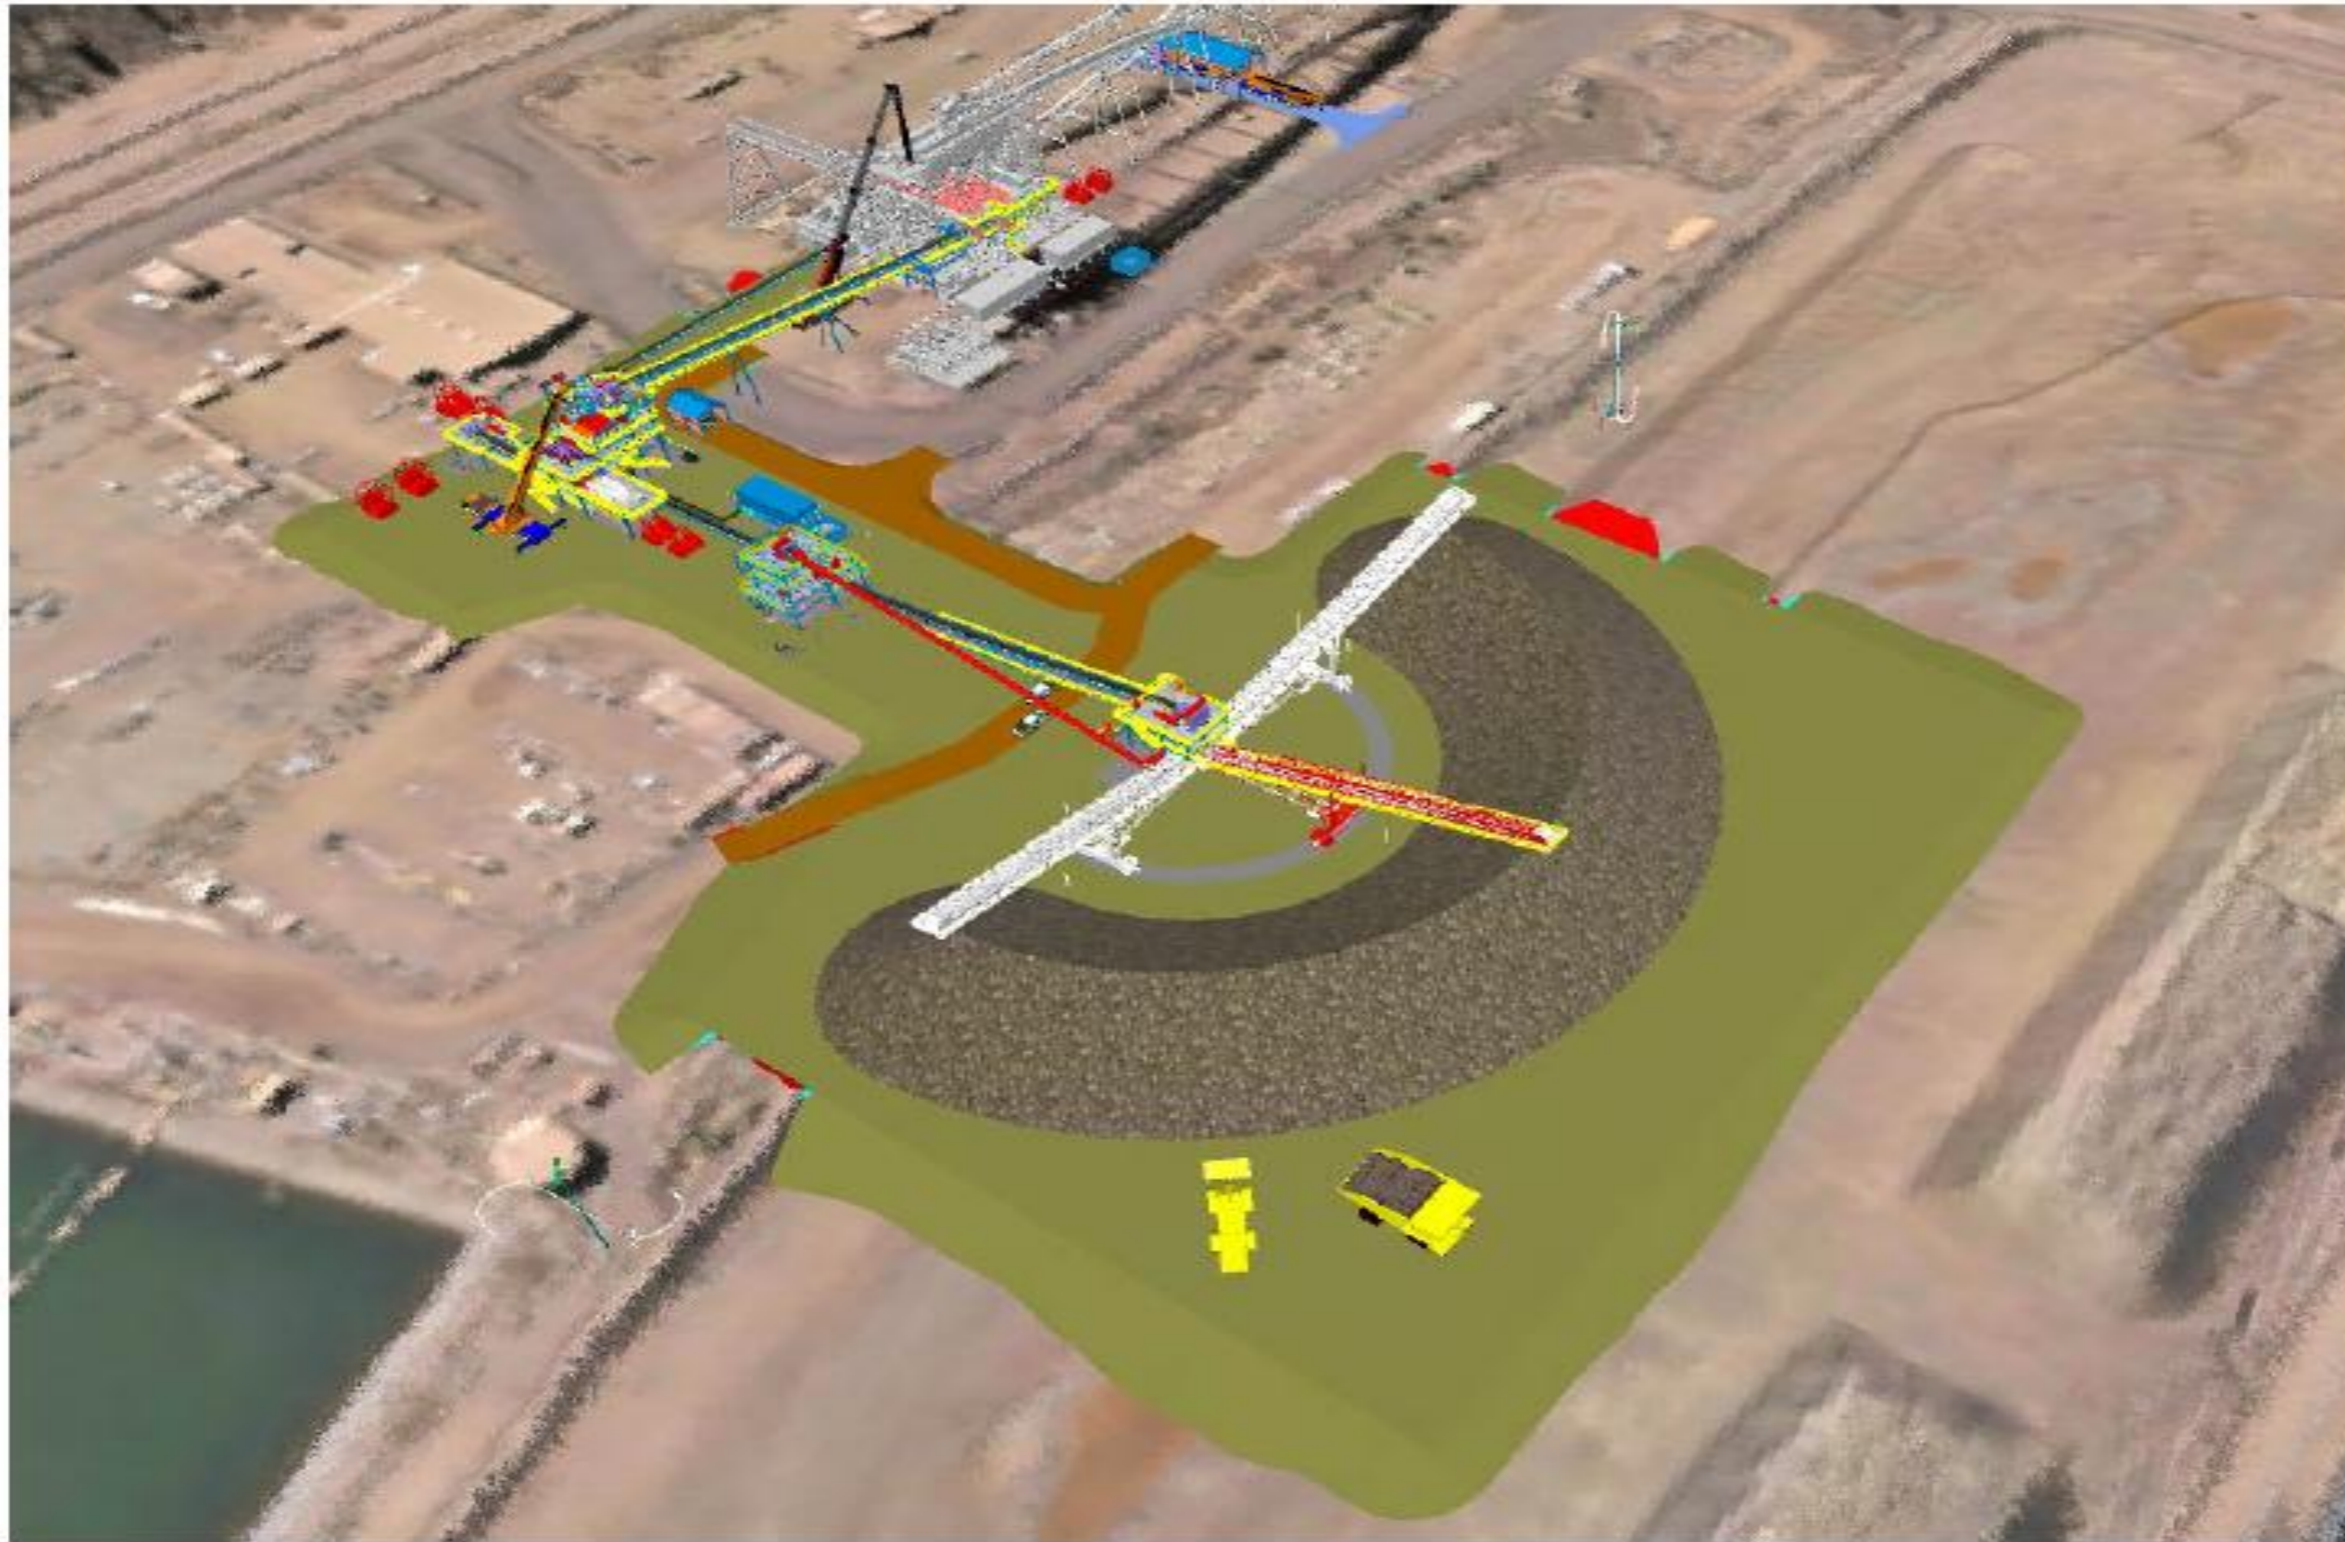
Indicative layout of proposed OPF1 Lump Plant
